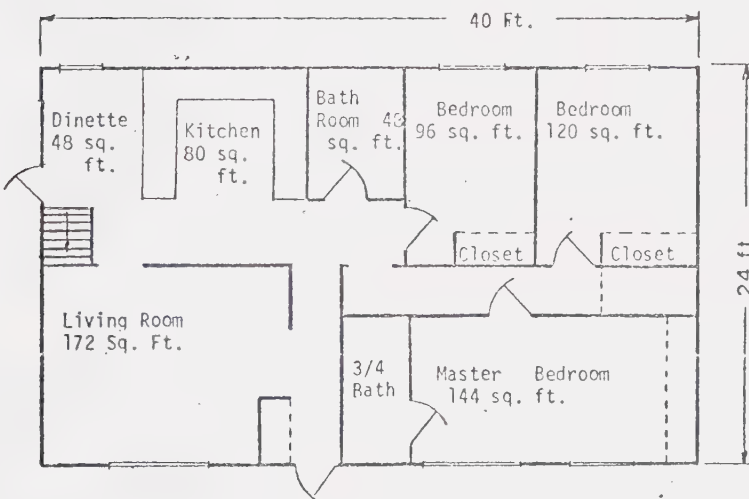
960 square feet (40' x 24') three bedroom floor plan (expansion one).
